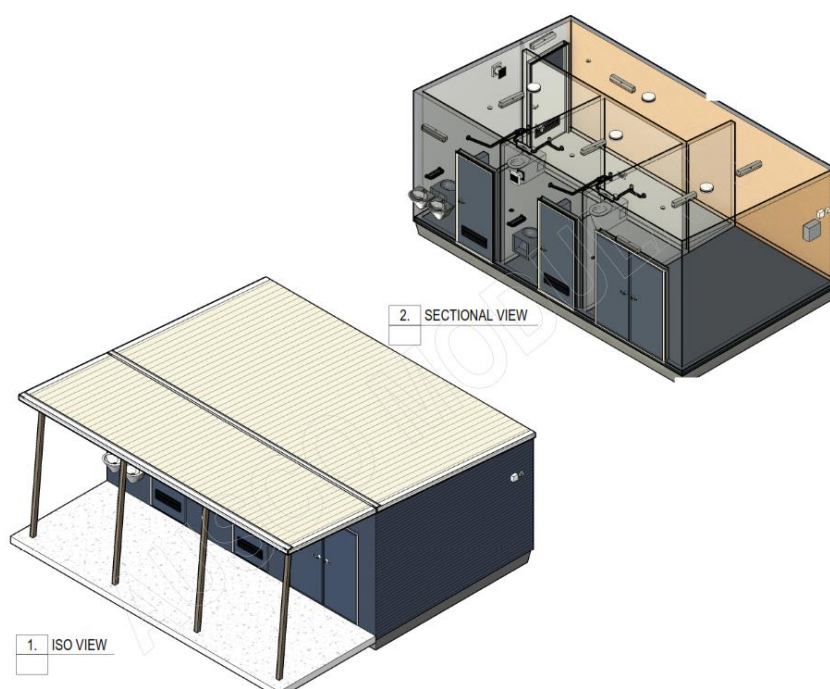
Beatty Park Reserve – Toilet Block Concept Plan
